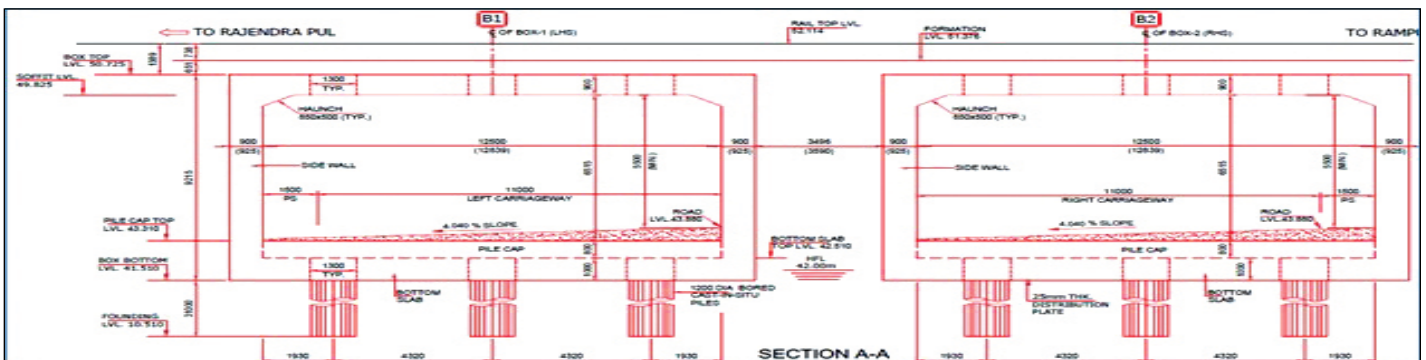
Finalized RUB2 Proposal with 2 Boxes Pushed under Railway Tracks with Provision of 1.2 m dia. Piles
